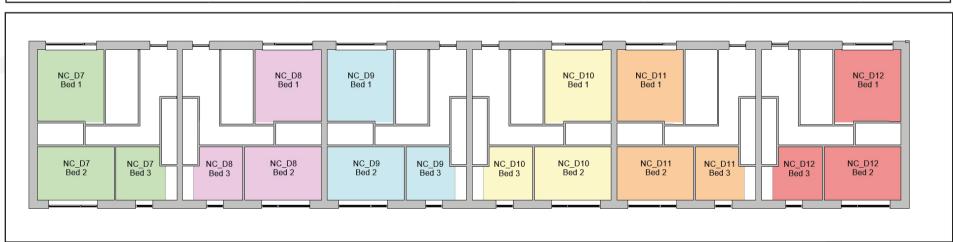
Floor plan of assessed building with keyplan highlighting the assessed building.
